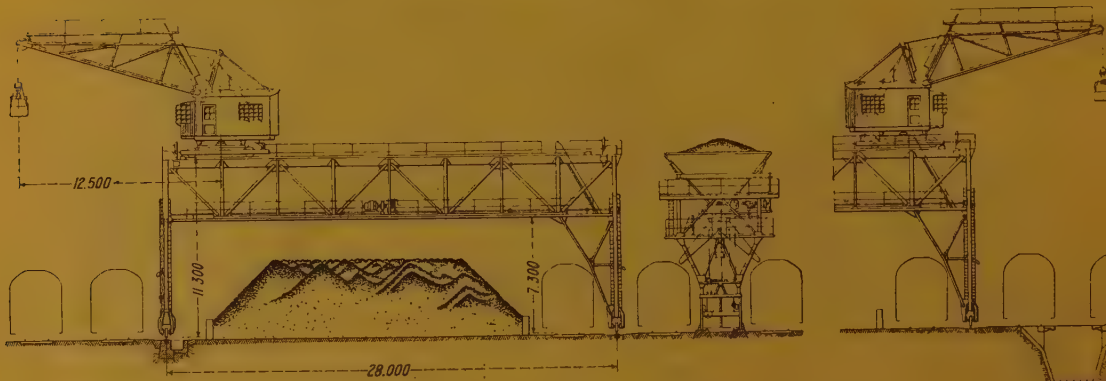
Sketch showing radius of operation. Dimensions in metres.
